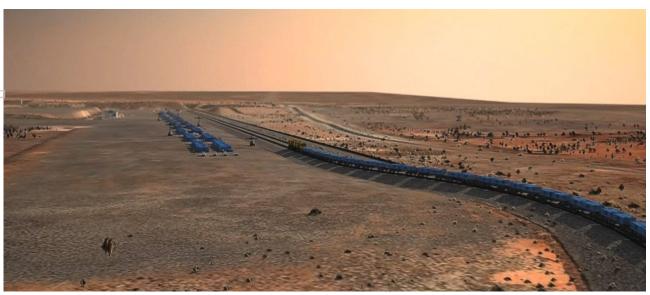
View looking north-west at the Cloncurry Multi-user Rail-load Facility - 3D design model
